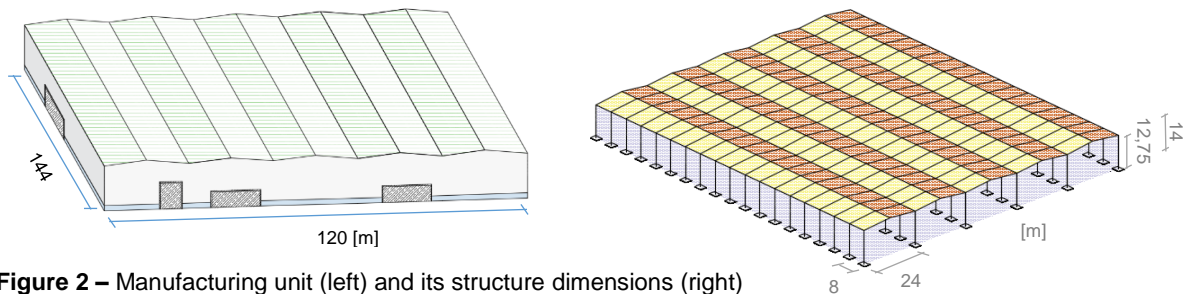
Manufacturing unit (left) and its structure dimensions (right)
